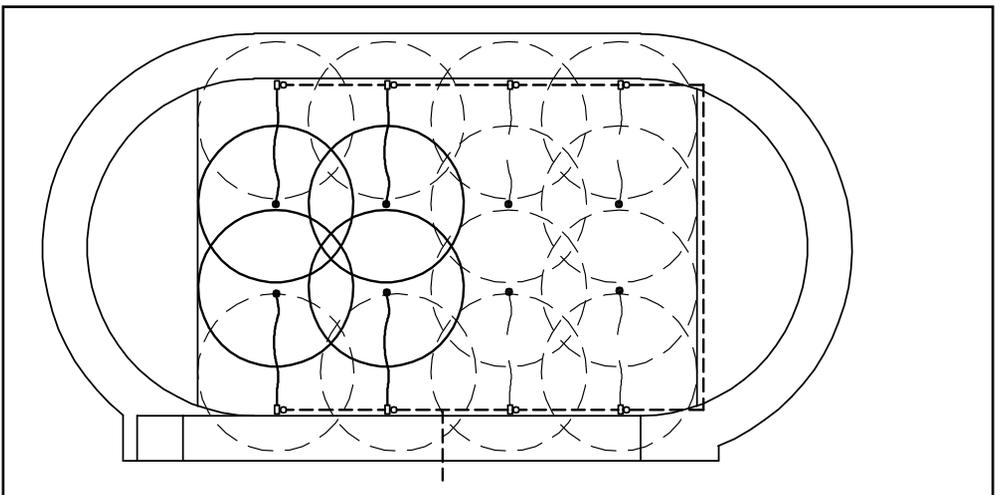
Sprinkling with hose-fed tripod-mounted sprinklers
